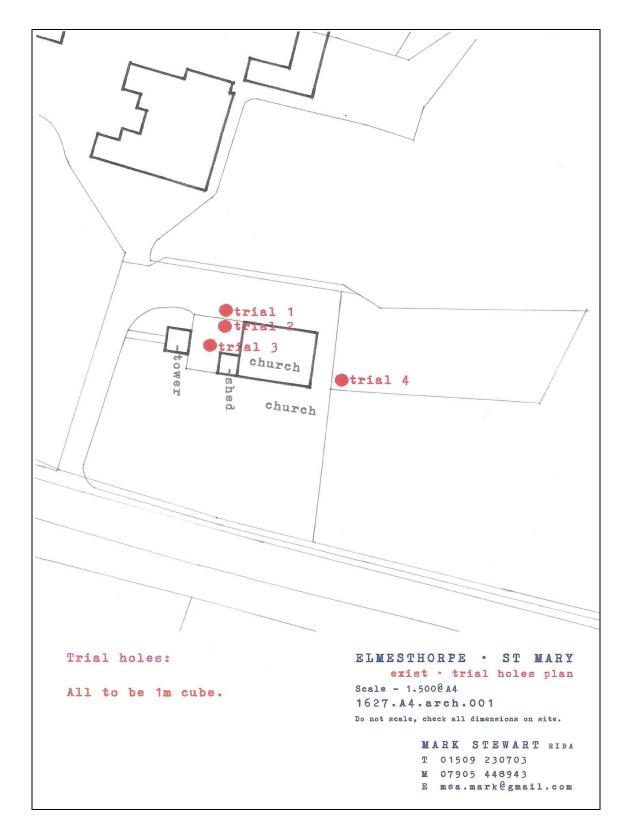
Site Plan showing proposed trial pit locations. Plan supplied by Mark Stewart.
